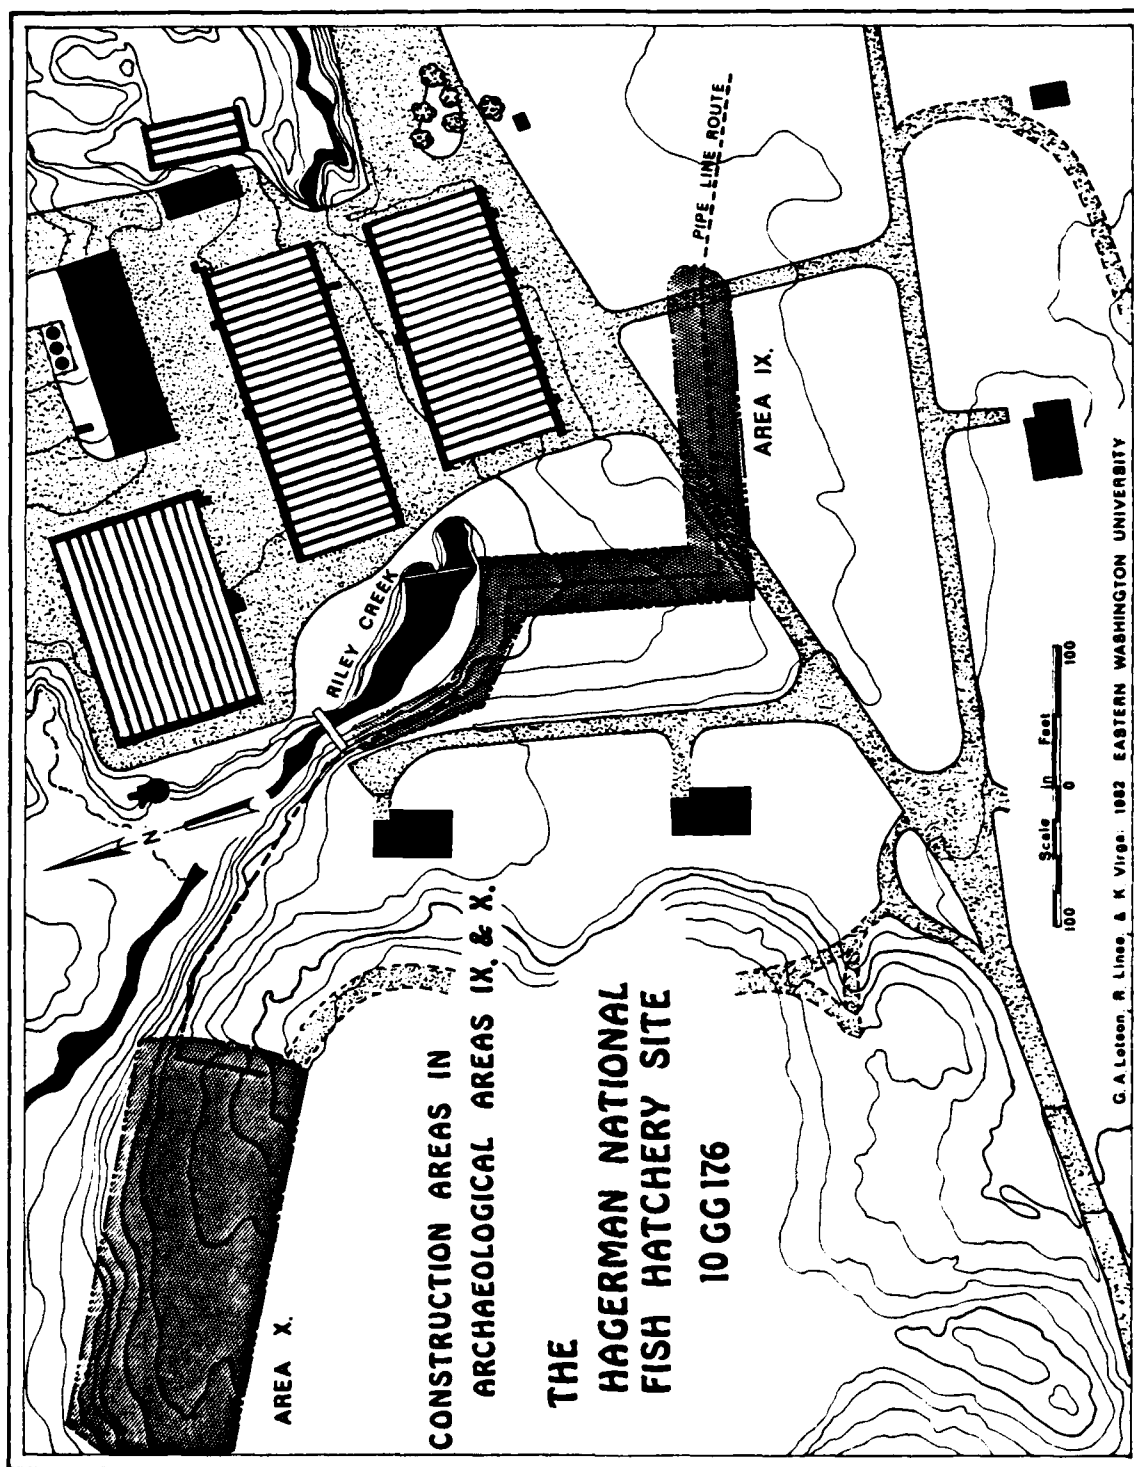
Pipeline construction and settling pond plans for Areas IX and X.
